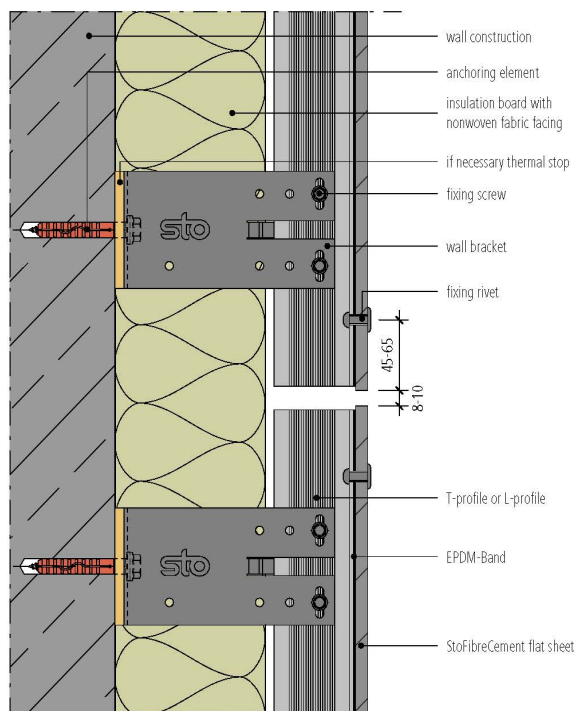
WALL BRACKET/TIMBER BATTENS
